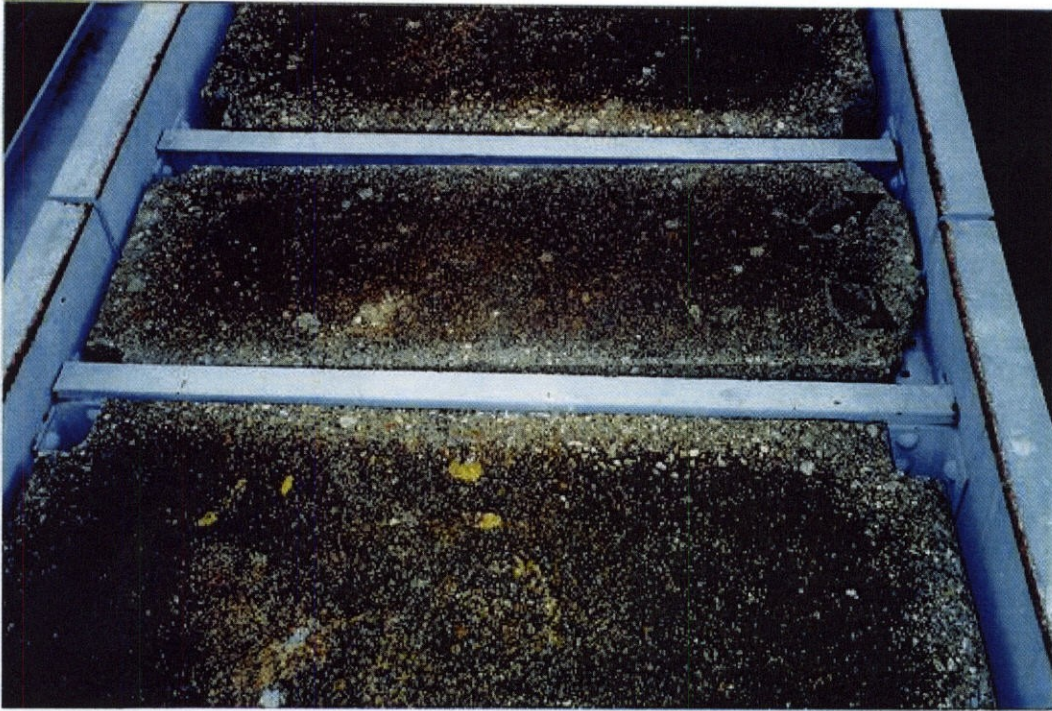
Panel L159e (note shoe size spall on each corner with only about half of its bearing surface remaining).
